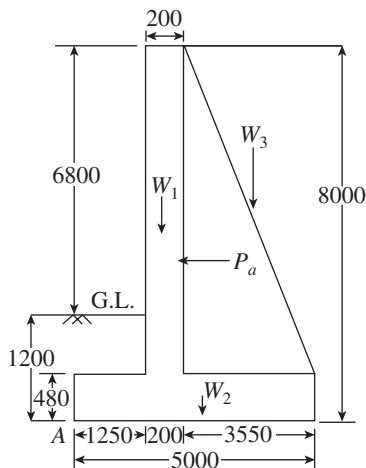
Preliminary dimensions of the counterfort-retaining wall
